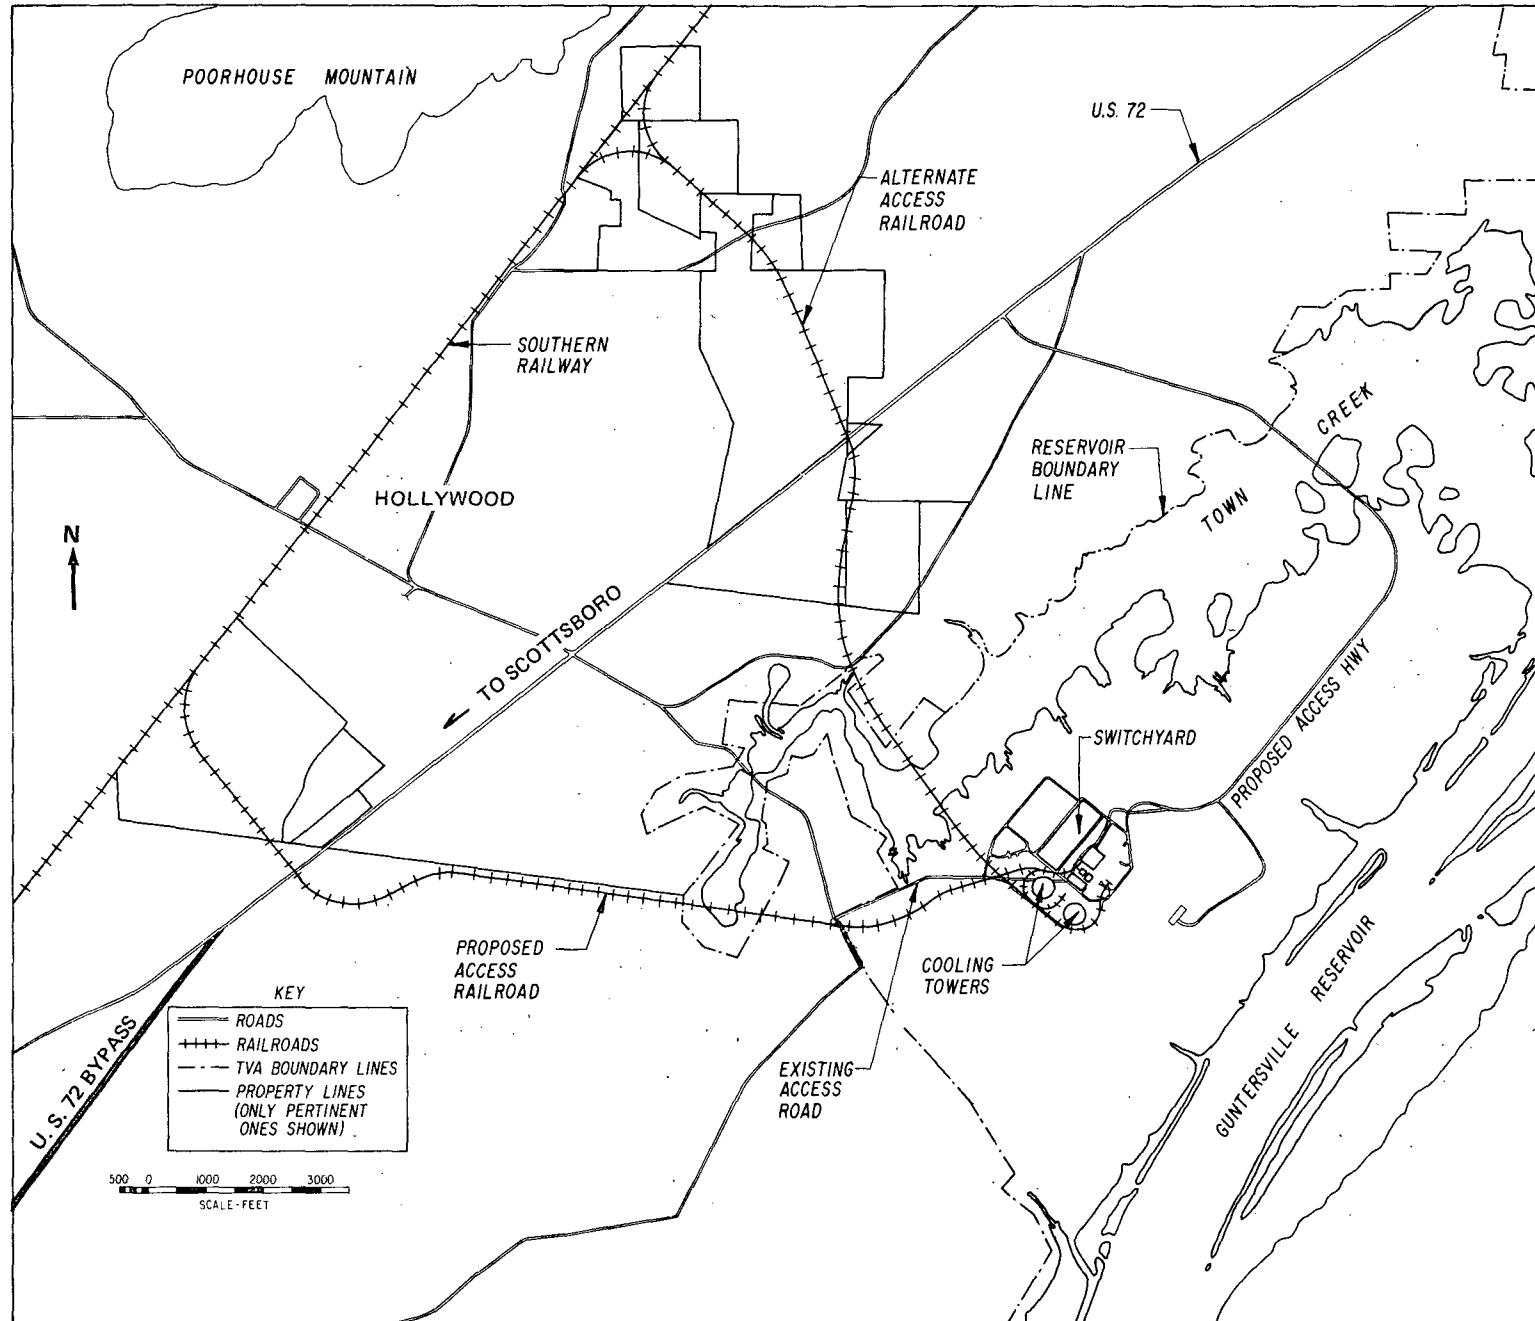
PROPOSED AND ALTERNATE ACCESS RAILROAD ROUTINGS.
